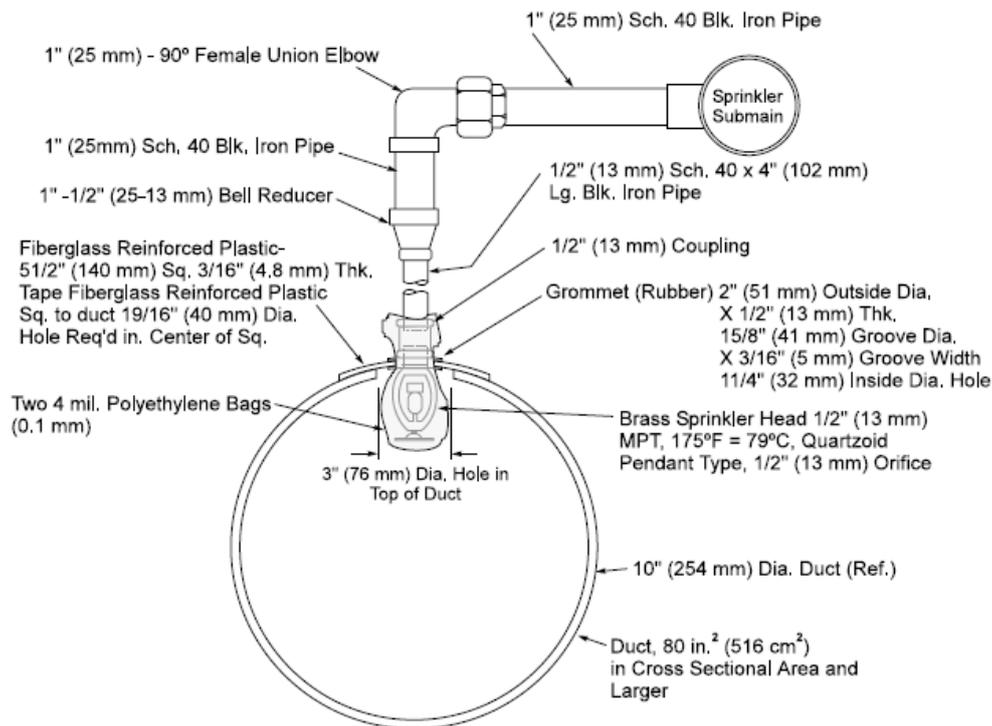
Typical sprinkler installation within a duct (Factory Mutual)
